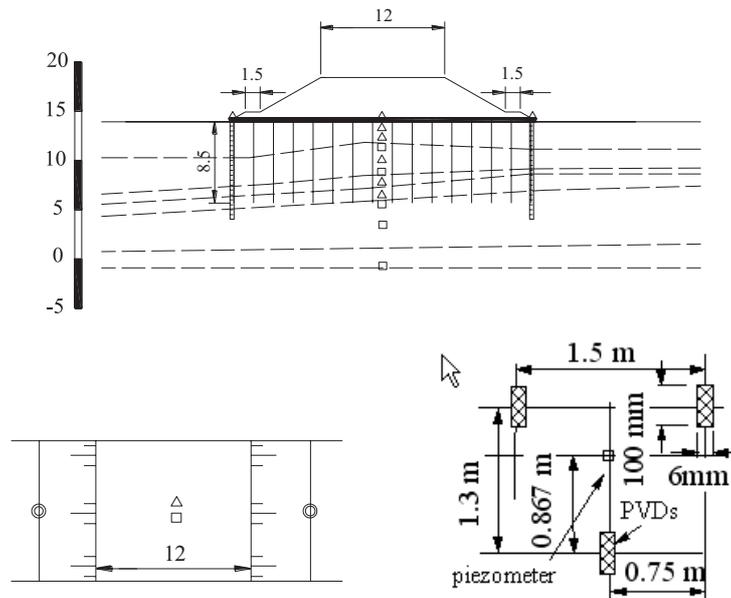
Cross-section and plan view of embankment, field instrumentation and arrangement of PVDs in field
